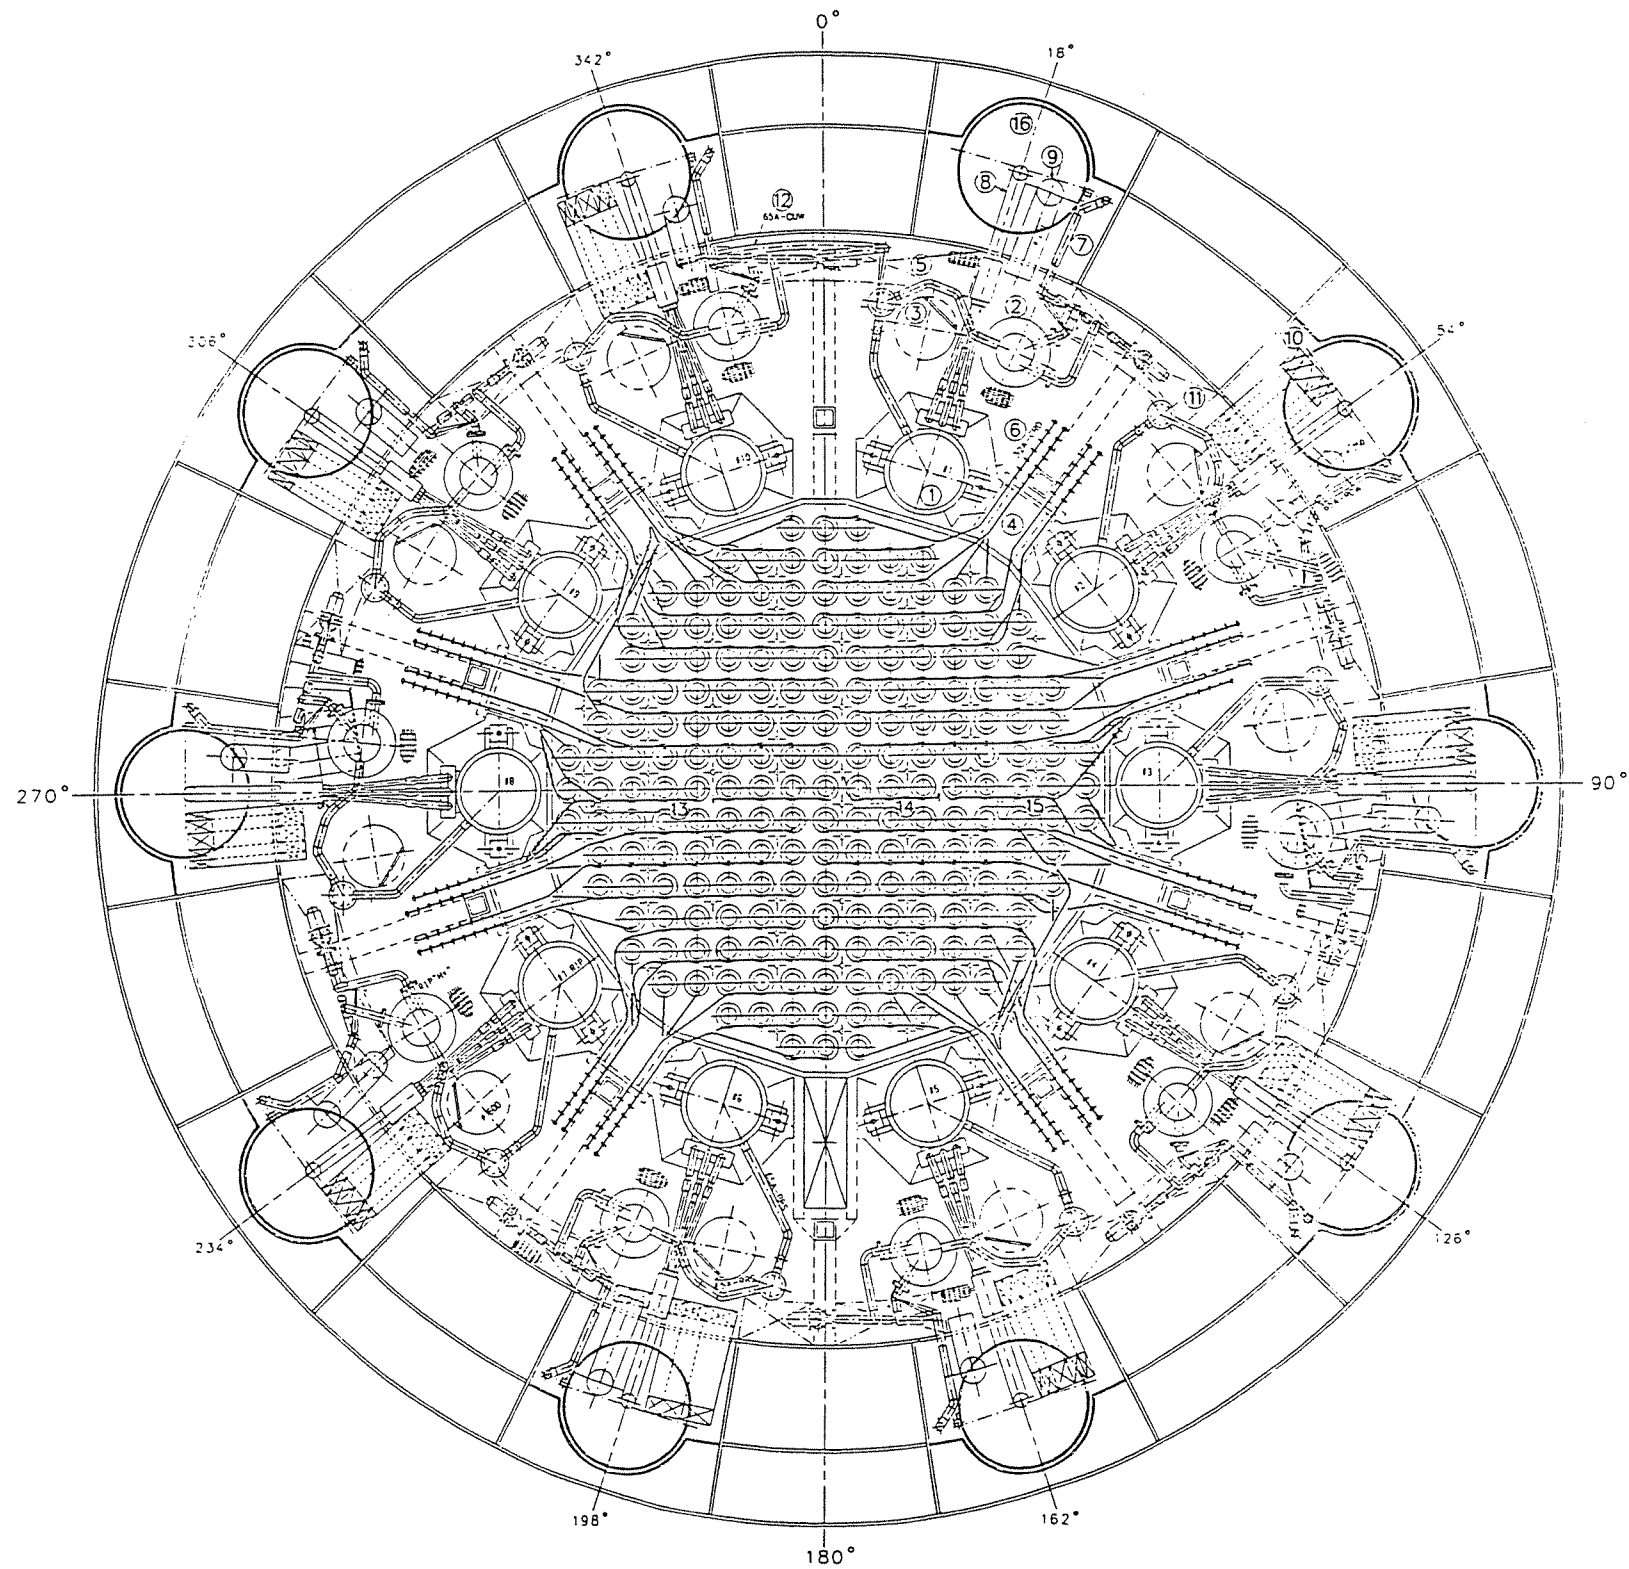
LOWER DRYWELL, ARRANGEMENT PLAN AT EL. -6600 TO -1850 mm
